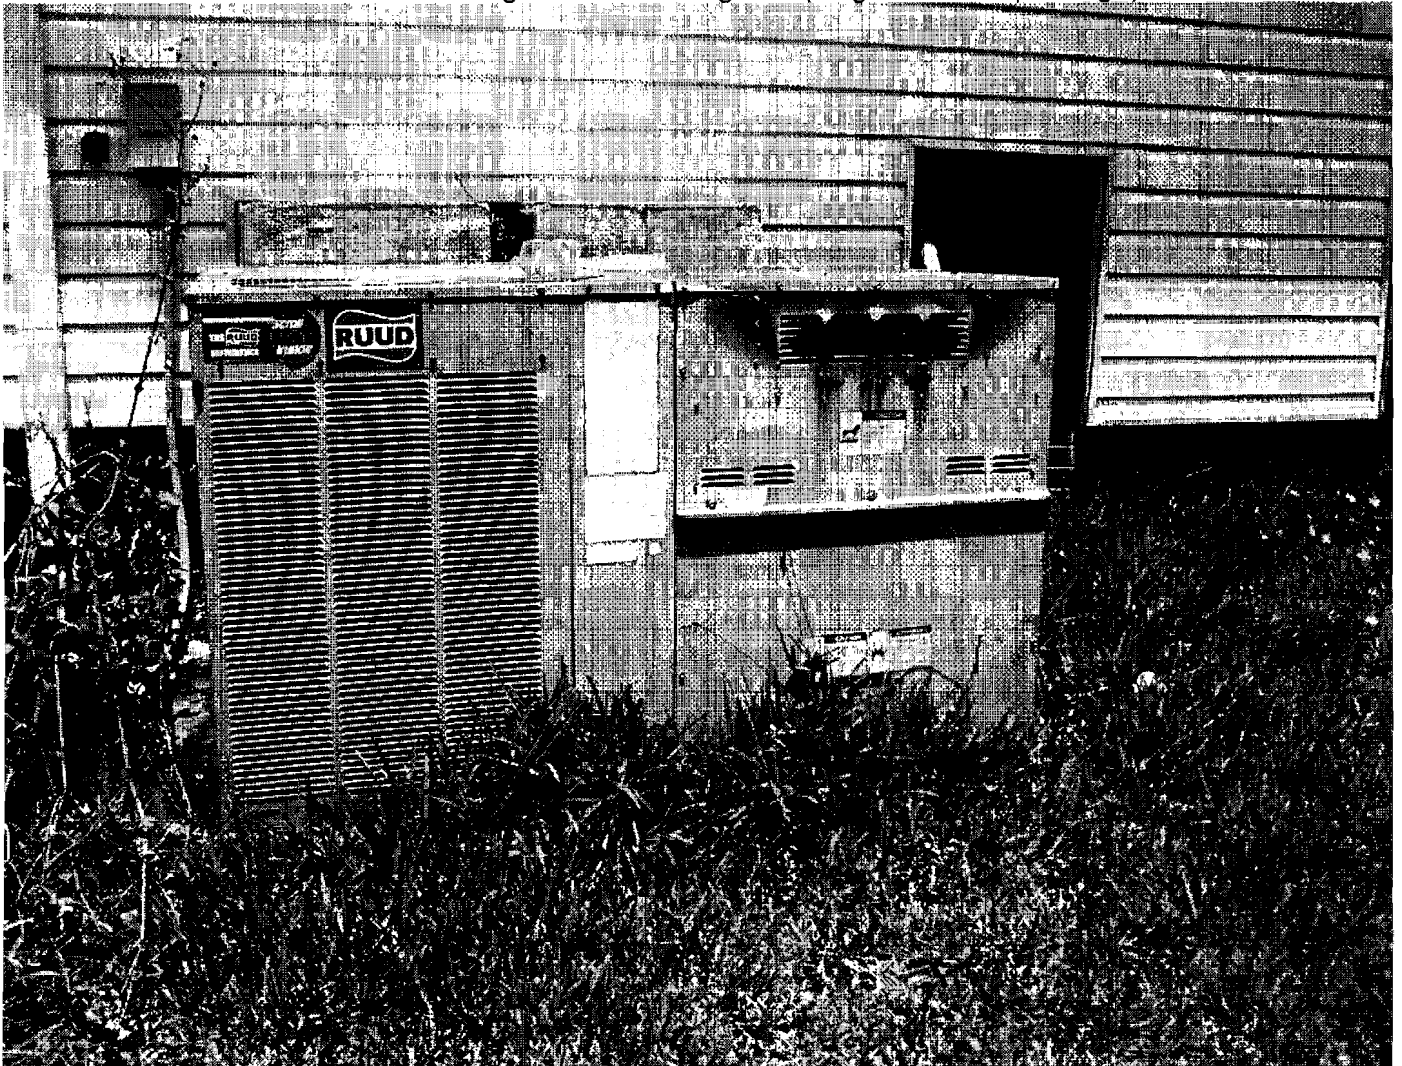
View of the central heating/air conditioning unit (single outdoor package).
